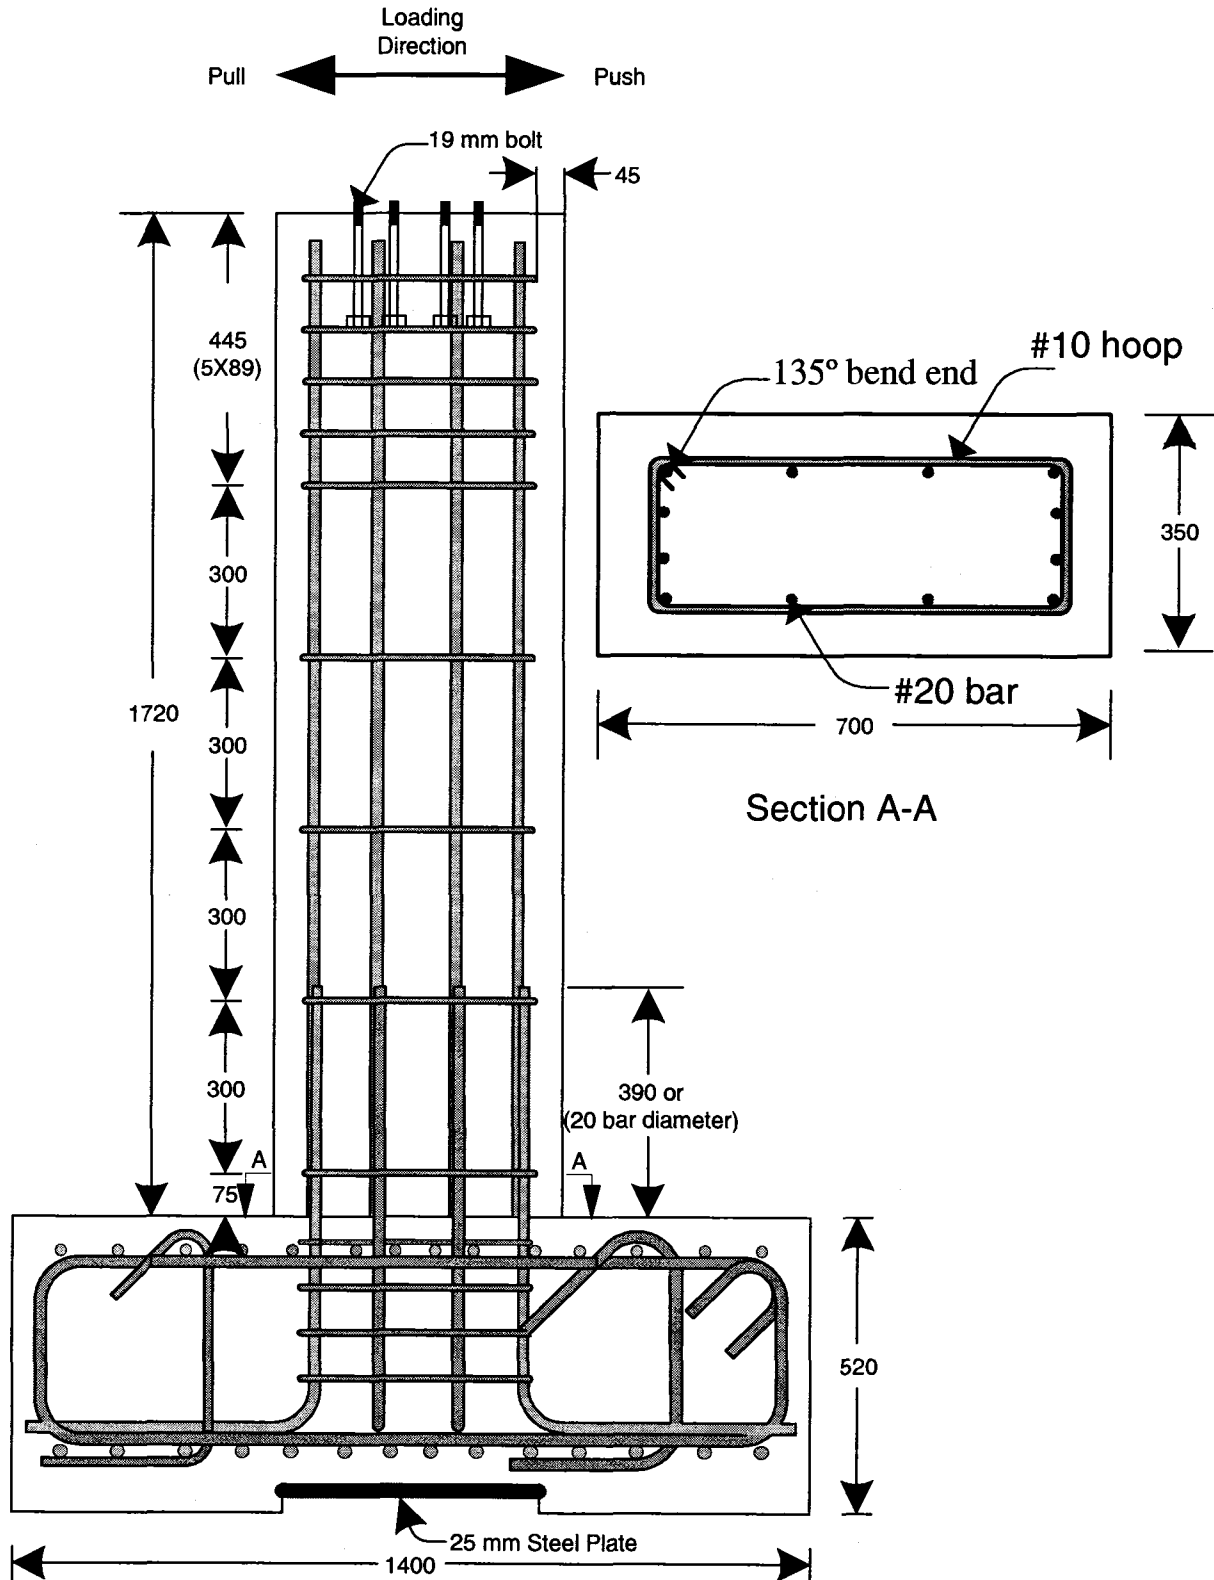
Geometry and reinforcement details for Columns LS-C and LS-R
